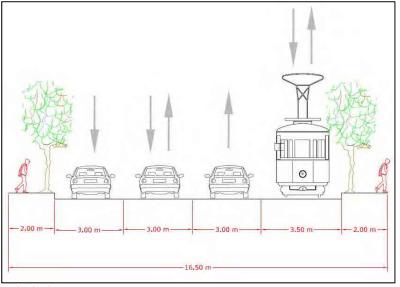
Typical Secondary Road Cross Section (RUT 1-3-3 (3), Asim Zeneli Road)
